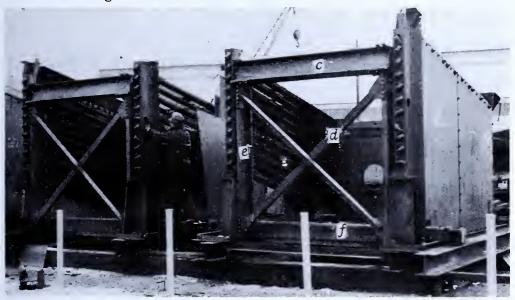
Rear of Boiler Ready for Steam-Generating Sections. Channel Supports (e); I Beam (c); Rear Angle Brace (d); Rear Water Wall Header (f).
